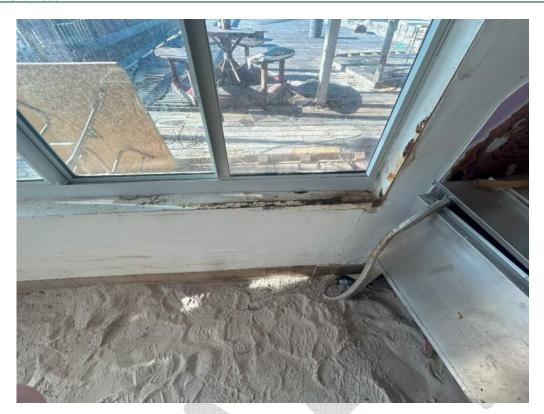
Corrosion in Metal Corner Beads of Interior Walls.
